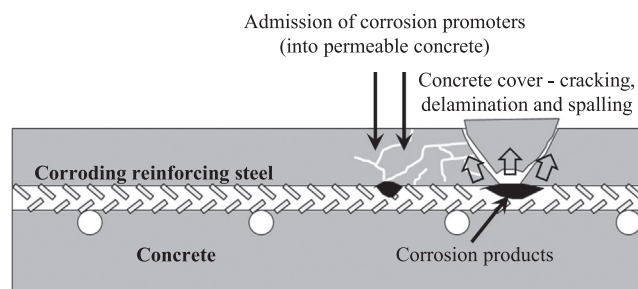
Corrosion of steel reinforcement at soffit slab causing concrete deterioration (modified from [8]).
